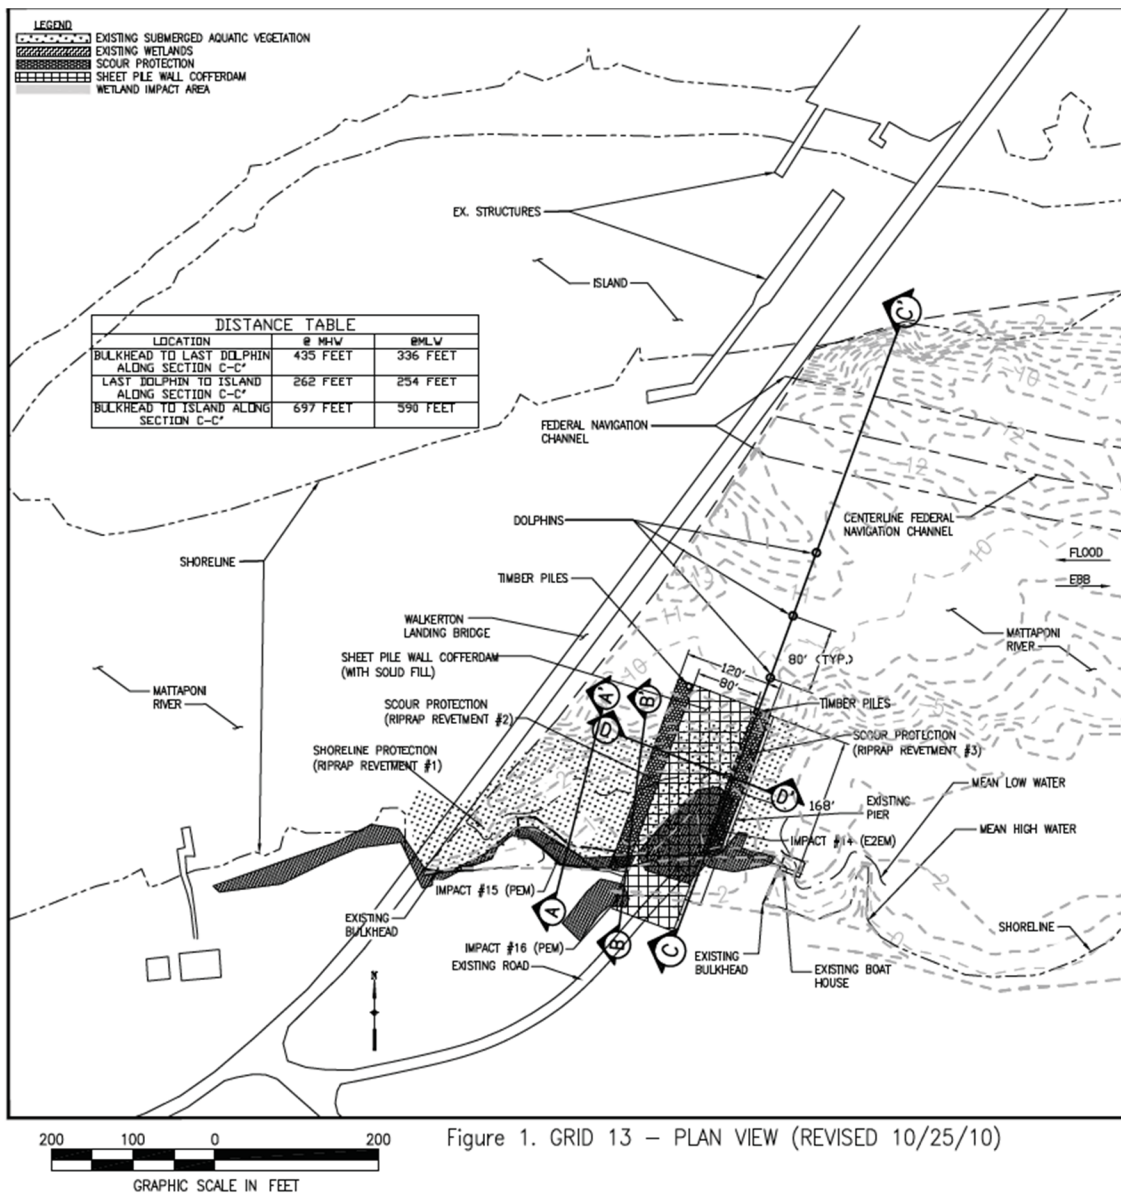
Walkerton Roll-Off Facility Construction Footprint. Source: EAEST 2010b
